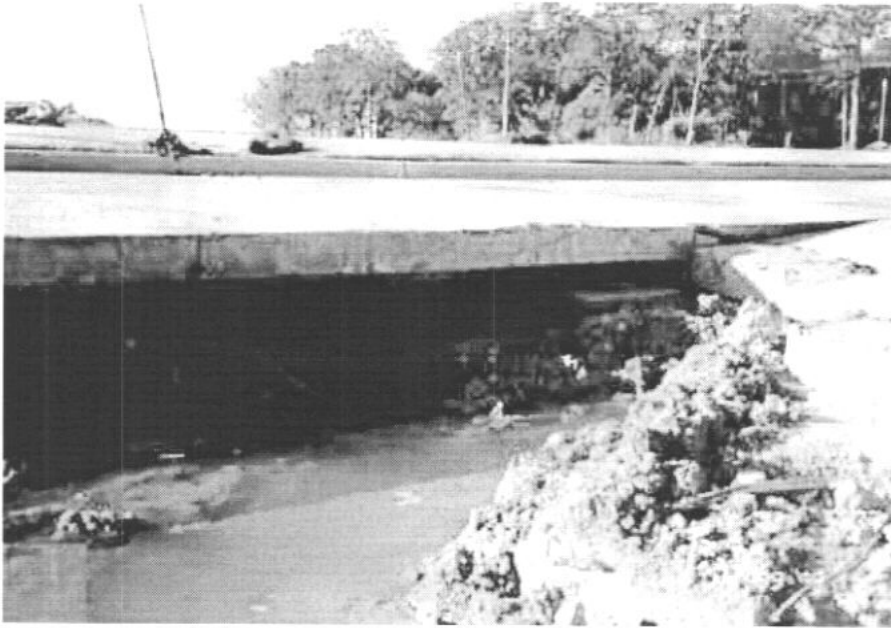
Post construction settlement of utility trench backfill. Note the resulting void beneath the pavement section.
